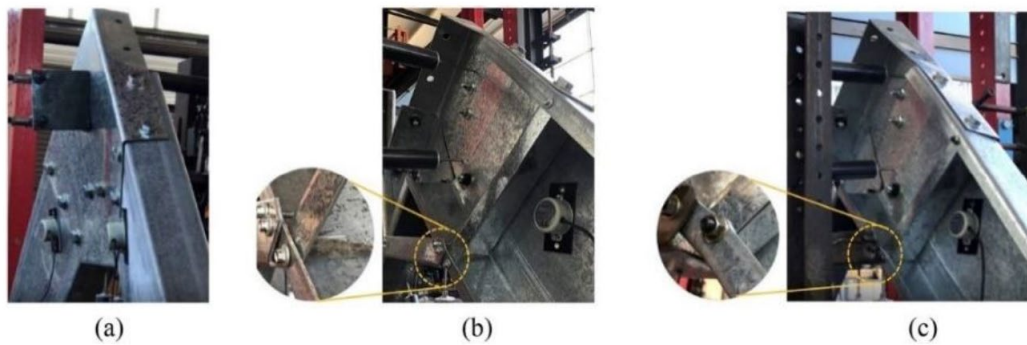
Failure modes of eaves joint tests after Rinchen and Rasmussen (2019b) (a) Out-of-plane bending of bracket; (b) Screw fracture in the specimen; (c) Lip tearing in the specimen
